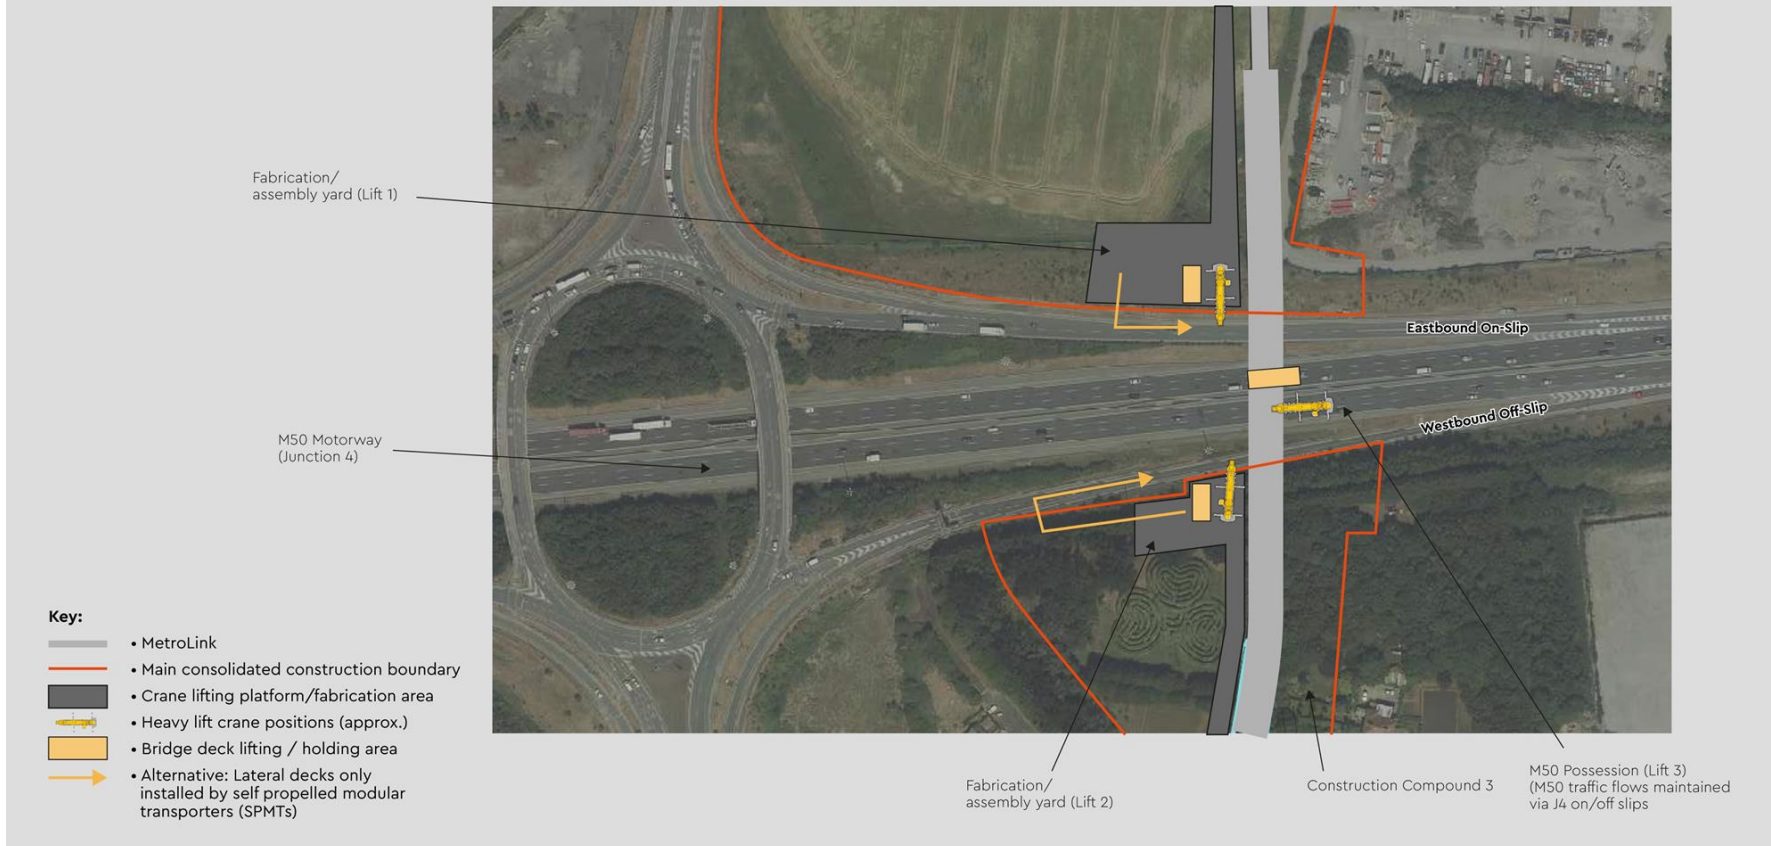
Crossing over the M50 - Bridge Beam Installation
